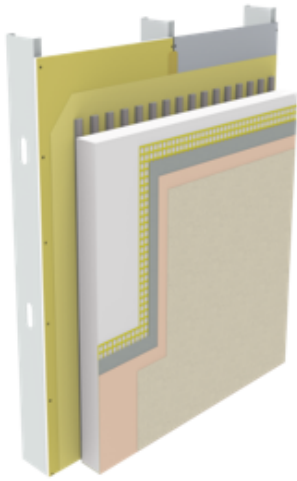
StoTherm®ci over glass mat gypsum or cement board over steel framing
